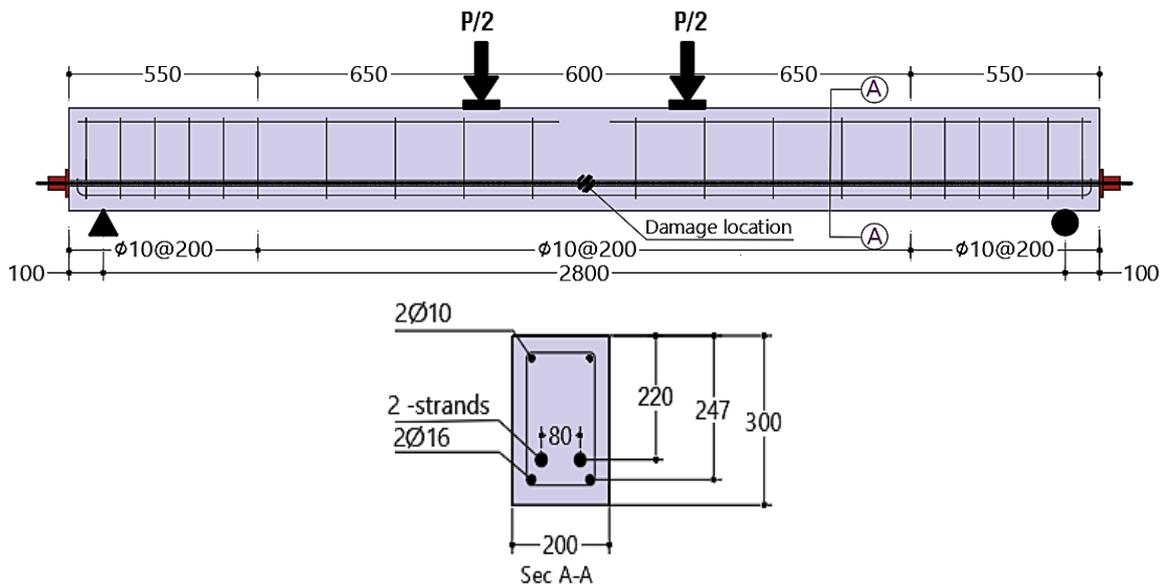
Reinforcement profile and stirrups distribution for tested girders
